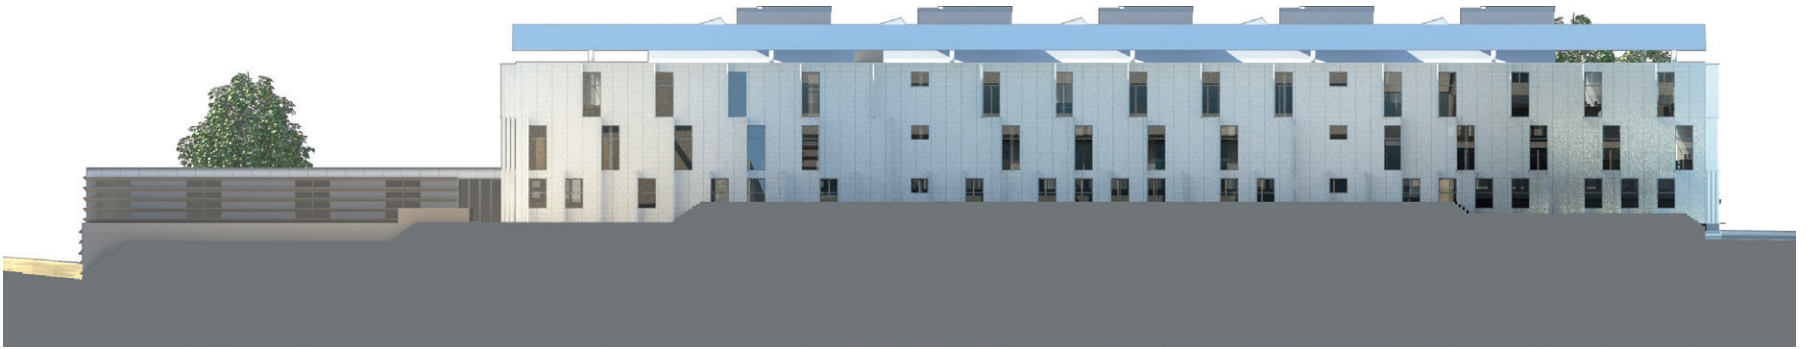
South elevation of the New Generation Office Building (Scale 1:500)
